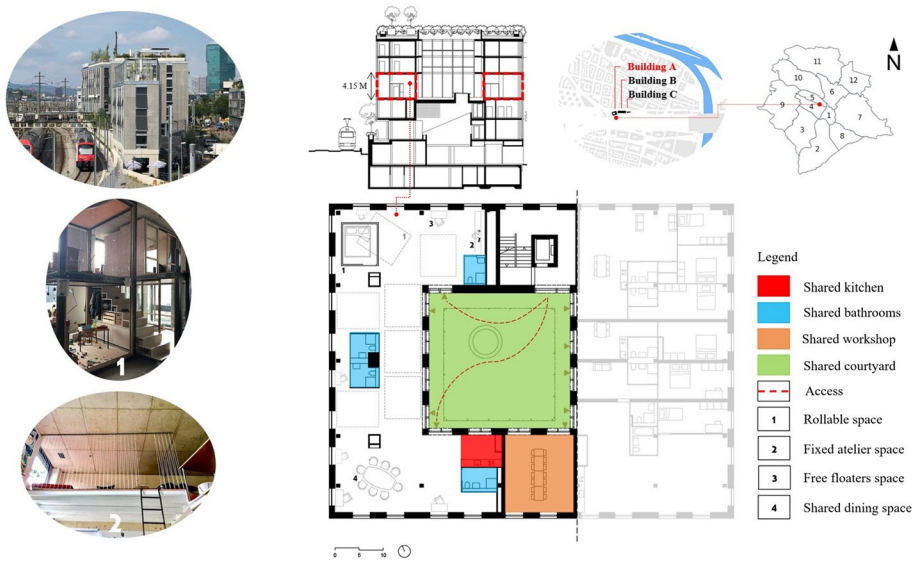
Site plan, section of building A and Hallenwohnen’s plan, Zollhaus complex in Zurich (Elaborated by Author based on architectural plans by Enzmann and Fischer Architekten, Zurich)
